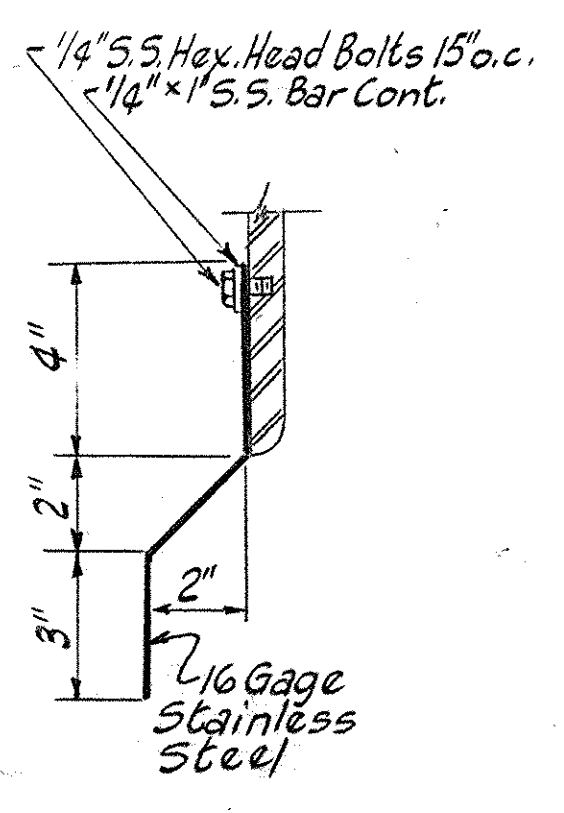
DETAIL OF BRIDGE ANCHOR ASSEMBLY
